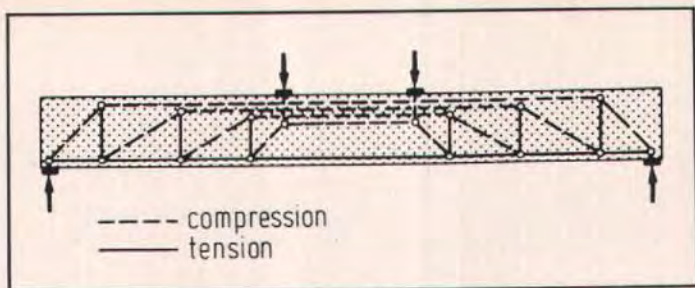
Strut-and-tie-model of a reinforced concrete beam loaded with two single loads.
